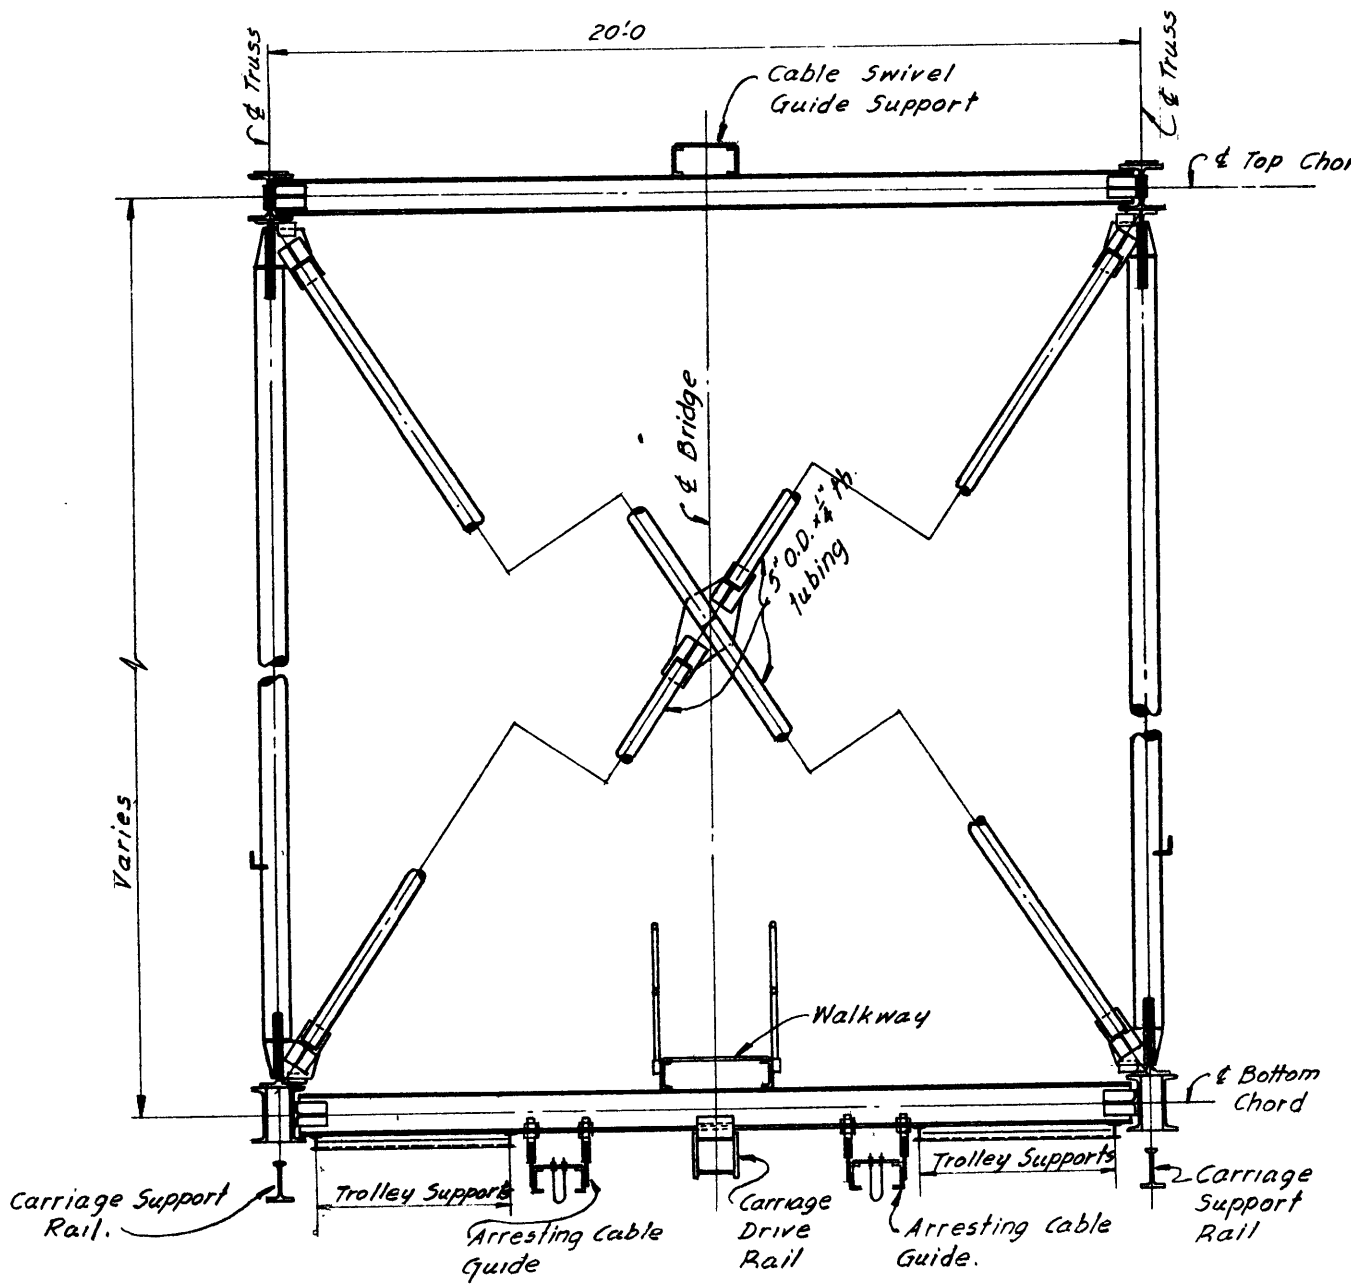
Cross Section Showing Maneuvering Bridge Carriage Drive and Support Rails
